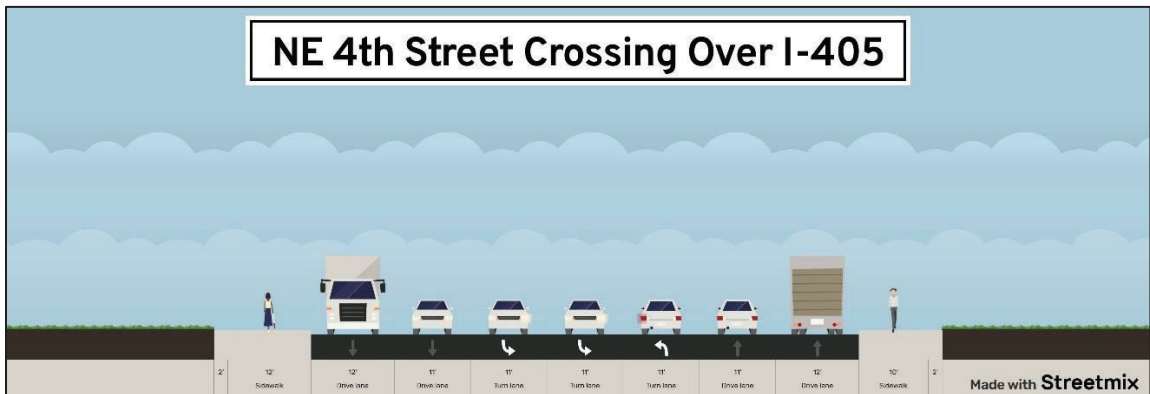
Existing NE 4<sup>th</sup> Street Cross-Section for the Crossing Over I-405 (facing west)
